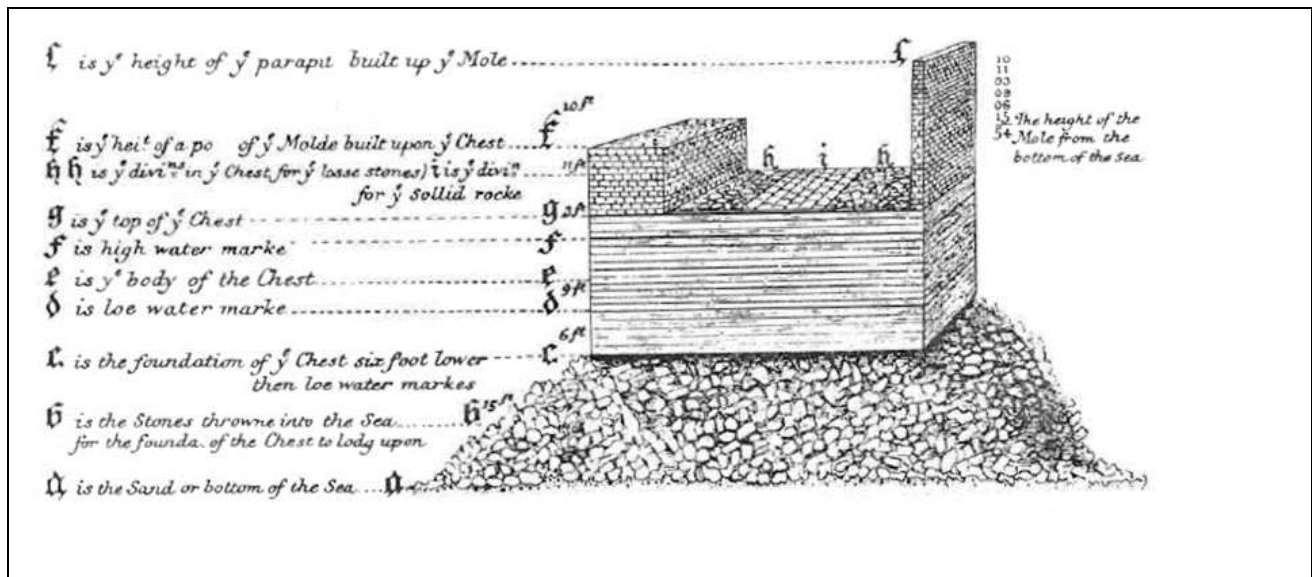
The Great Chest constructed by Mr Shere, June 1677
